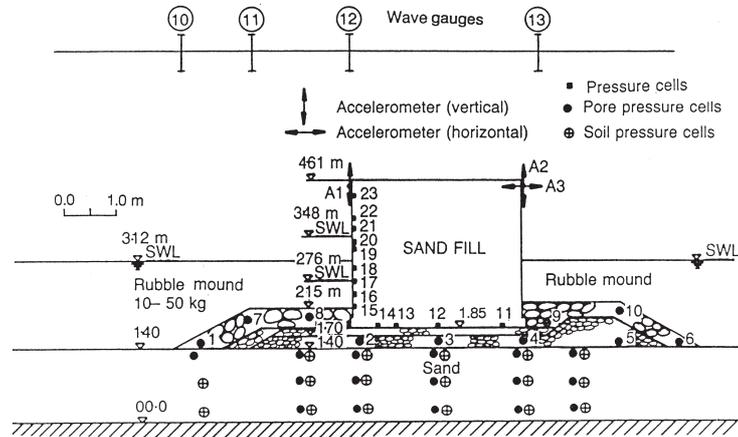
Cross-section of the caisson model with installed instrumentation /14/.
